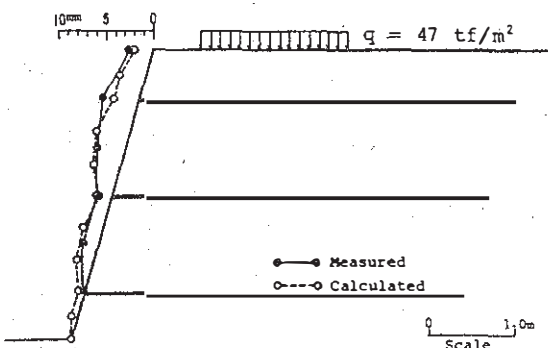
Deflection of Slope Surface (reinforcing members L = 4.0 m)
